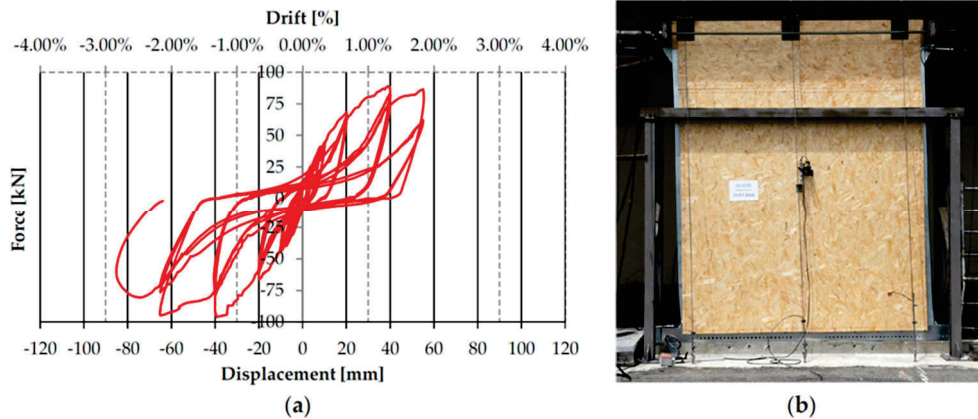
Hybrid steel column and OSB panels shear wall proposed by [31]
